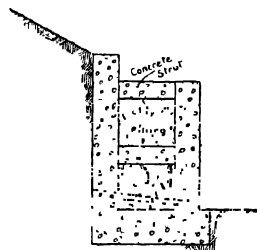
Composite Retaining Wall; an Example of Economical Construction.
